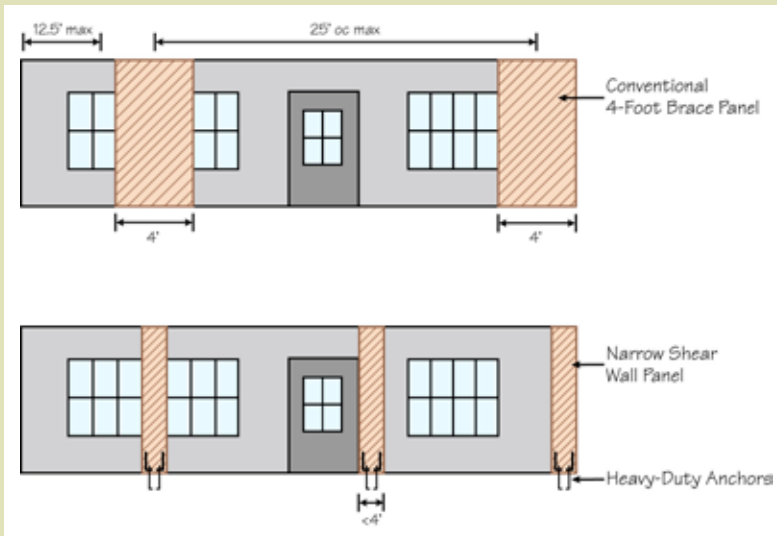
Illustration of conventional 4-foot-wide braced wall panel (top) and narrow shear wall panel applications (bottom).
